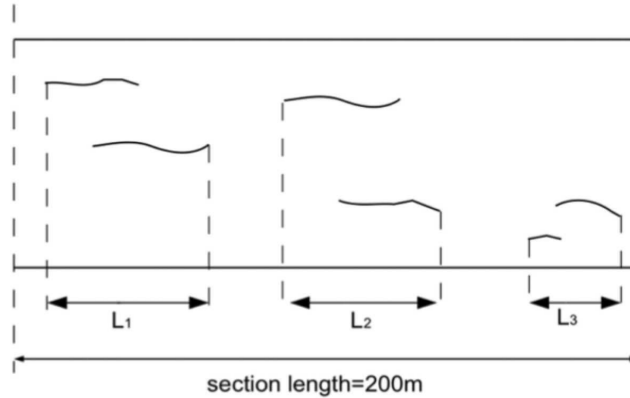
Longitudinal cracking percentage metric for 200m road section
